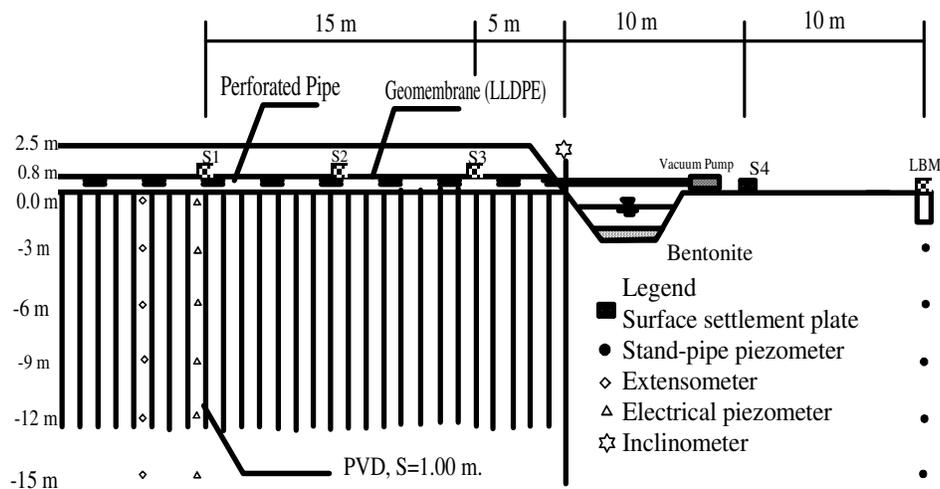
Cross section of embankment TV2 and location of monitoring system (Indraratna et al., 2005d)
